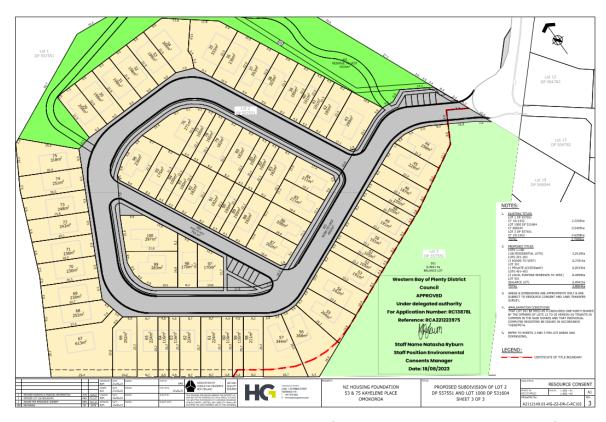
Approved Scheme Plan RC13878LS (showing Lot 202, being Road 2).
